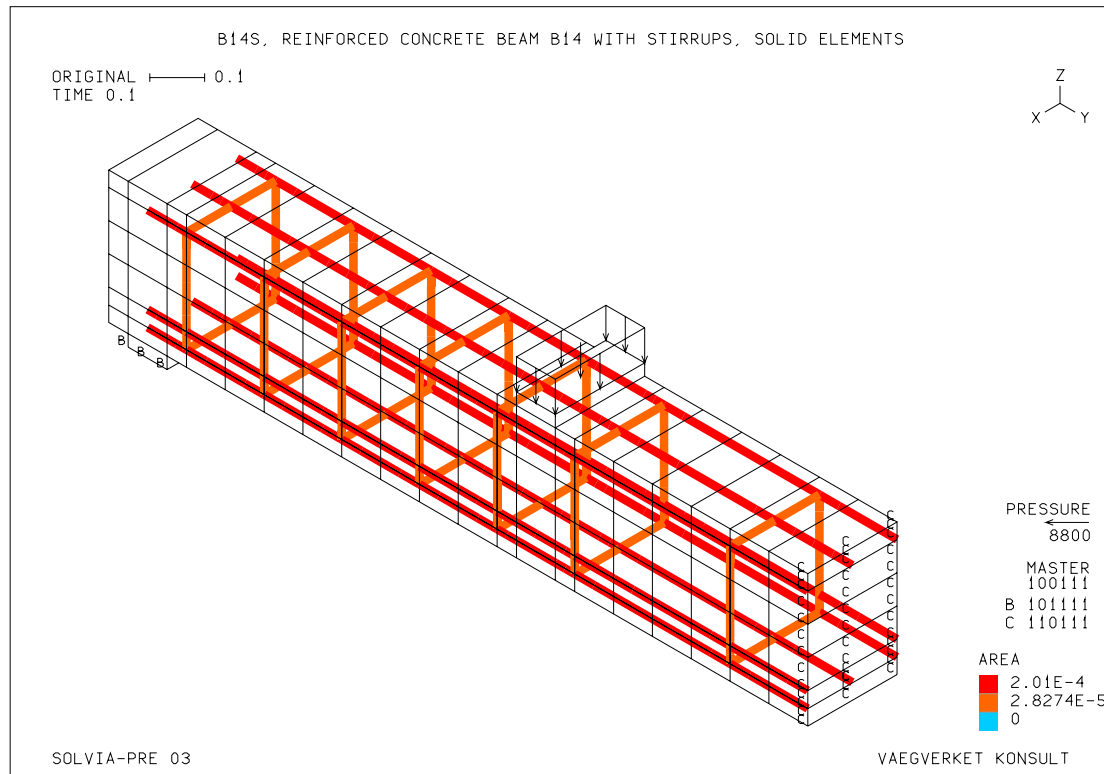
Mesh of the concrete with shown location of the reinforcement for model 5.
